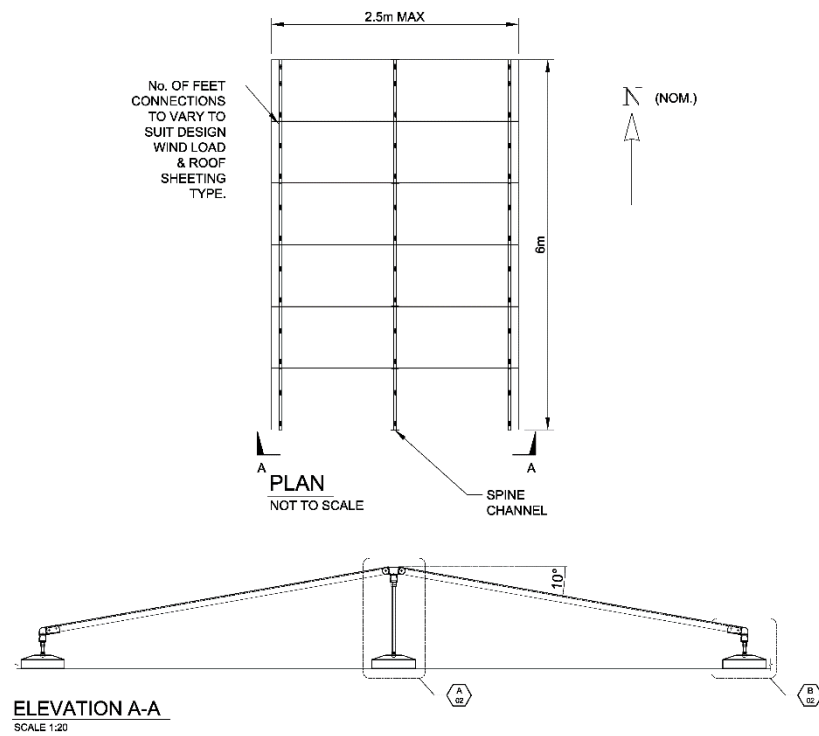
Solar panel array layout, as used in the wind tunnel testing.
